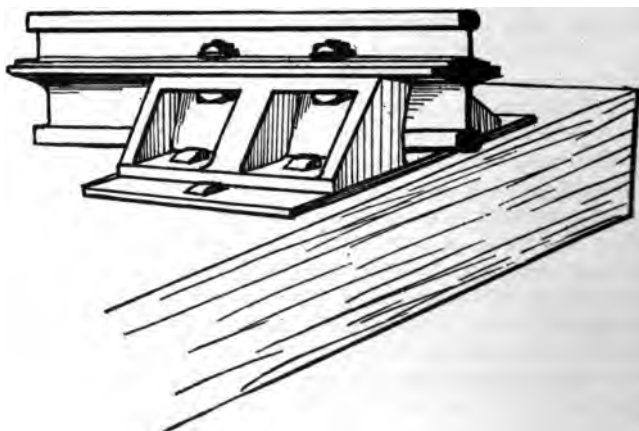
Special Rail Section to Prevent Creeping on Bridges
